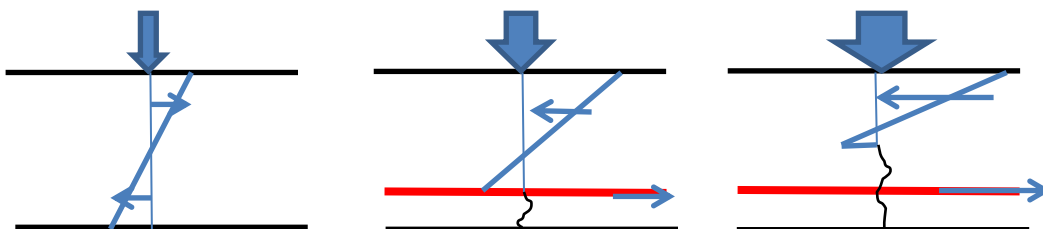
Simplified stress conditions in a reinforced concrete beam when subjected to a bending moment.
